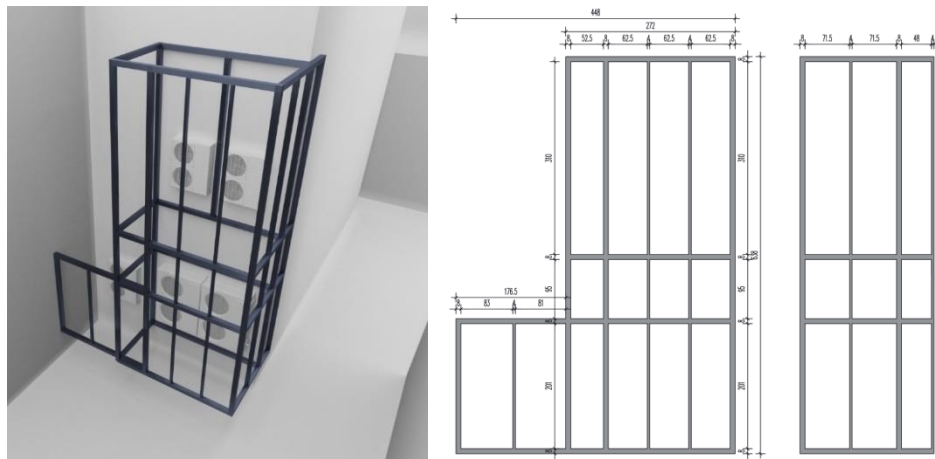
Appearance of the steel structure of the designed barrier (left) and dimensions of the steel structure (right)
